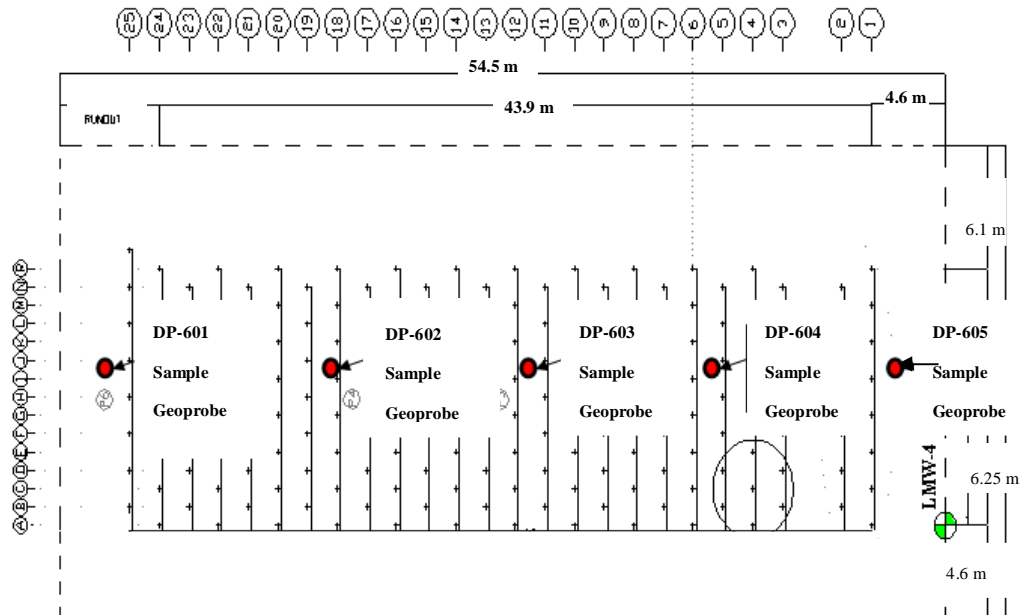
Schematic plan view of test pad and location of soil logs.
